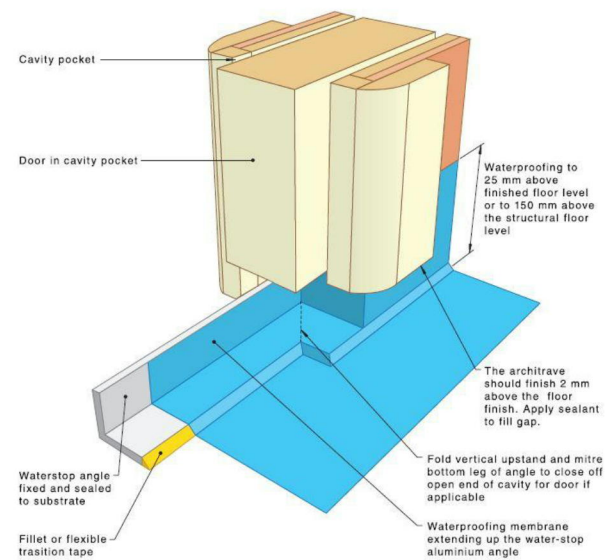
(B) — Waterproofing at door opening cavity slider
